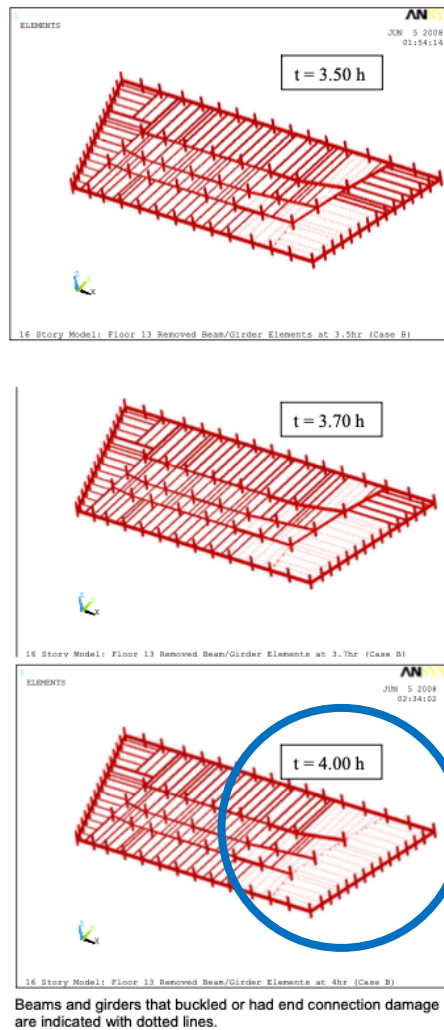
merely identifies that Girder A2001’s connection at Column 79 failed in NIST’s 16-story ANSYS model. It does not explain how beam K3004 expanded sufficiently to make Girder A2001 walk off its support at Column 79.
